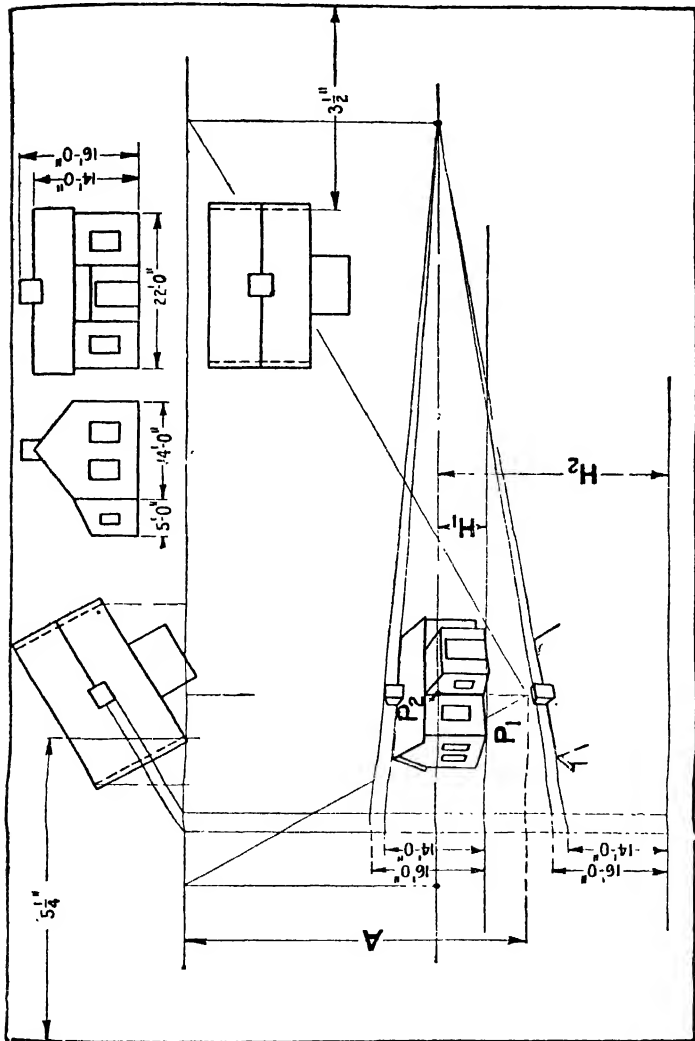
, 399.—Perspective of a house. The projections are given, long side of house making an angle of 30° with the picture plane. Nearest vertical edge of house to lie in the picture plane. Two perspective views of the house shall be obtained, the house being viewed from two different points. Their common distance in plan $A = 46'$. The distances H_1 and H_2 of the point of sight above the horizontal shall be $6'-0"$ and $31'-6"$, respectively. The construction of both views is exactly the same. The fact that the porch projects in part in front of the picture plane makes no difference in the construction of the perspective projection.
